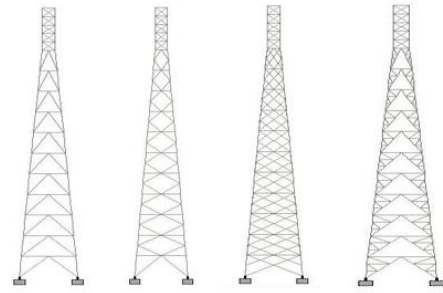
Elevation of towers with K-X, XB-X, W-X, V-X Bracings
